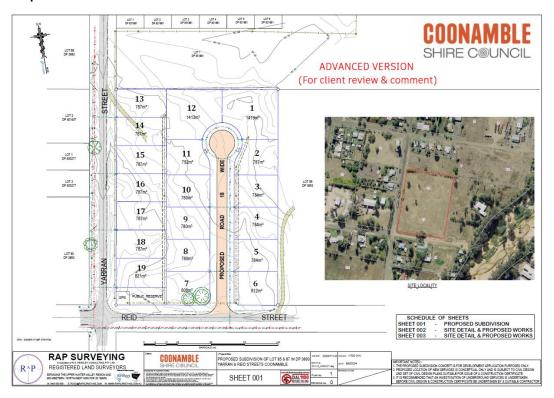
Proposed Subdivision Plan (Source: RAP Surveying)
